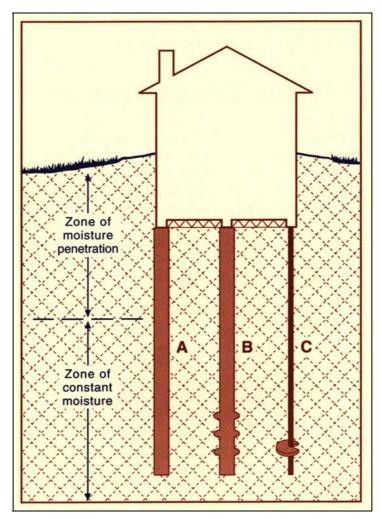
Three types of drilled piers commonly used in Colorado. (A) Straight-shafted concrete pier. (B) Concrete pier with grooves near base. (C) Helical steel pier. All piers should extend well below the anticipated zone of moisture penetration. From Noe and others (1997).
